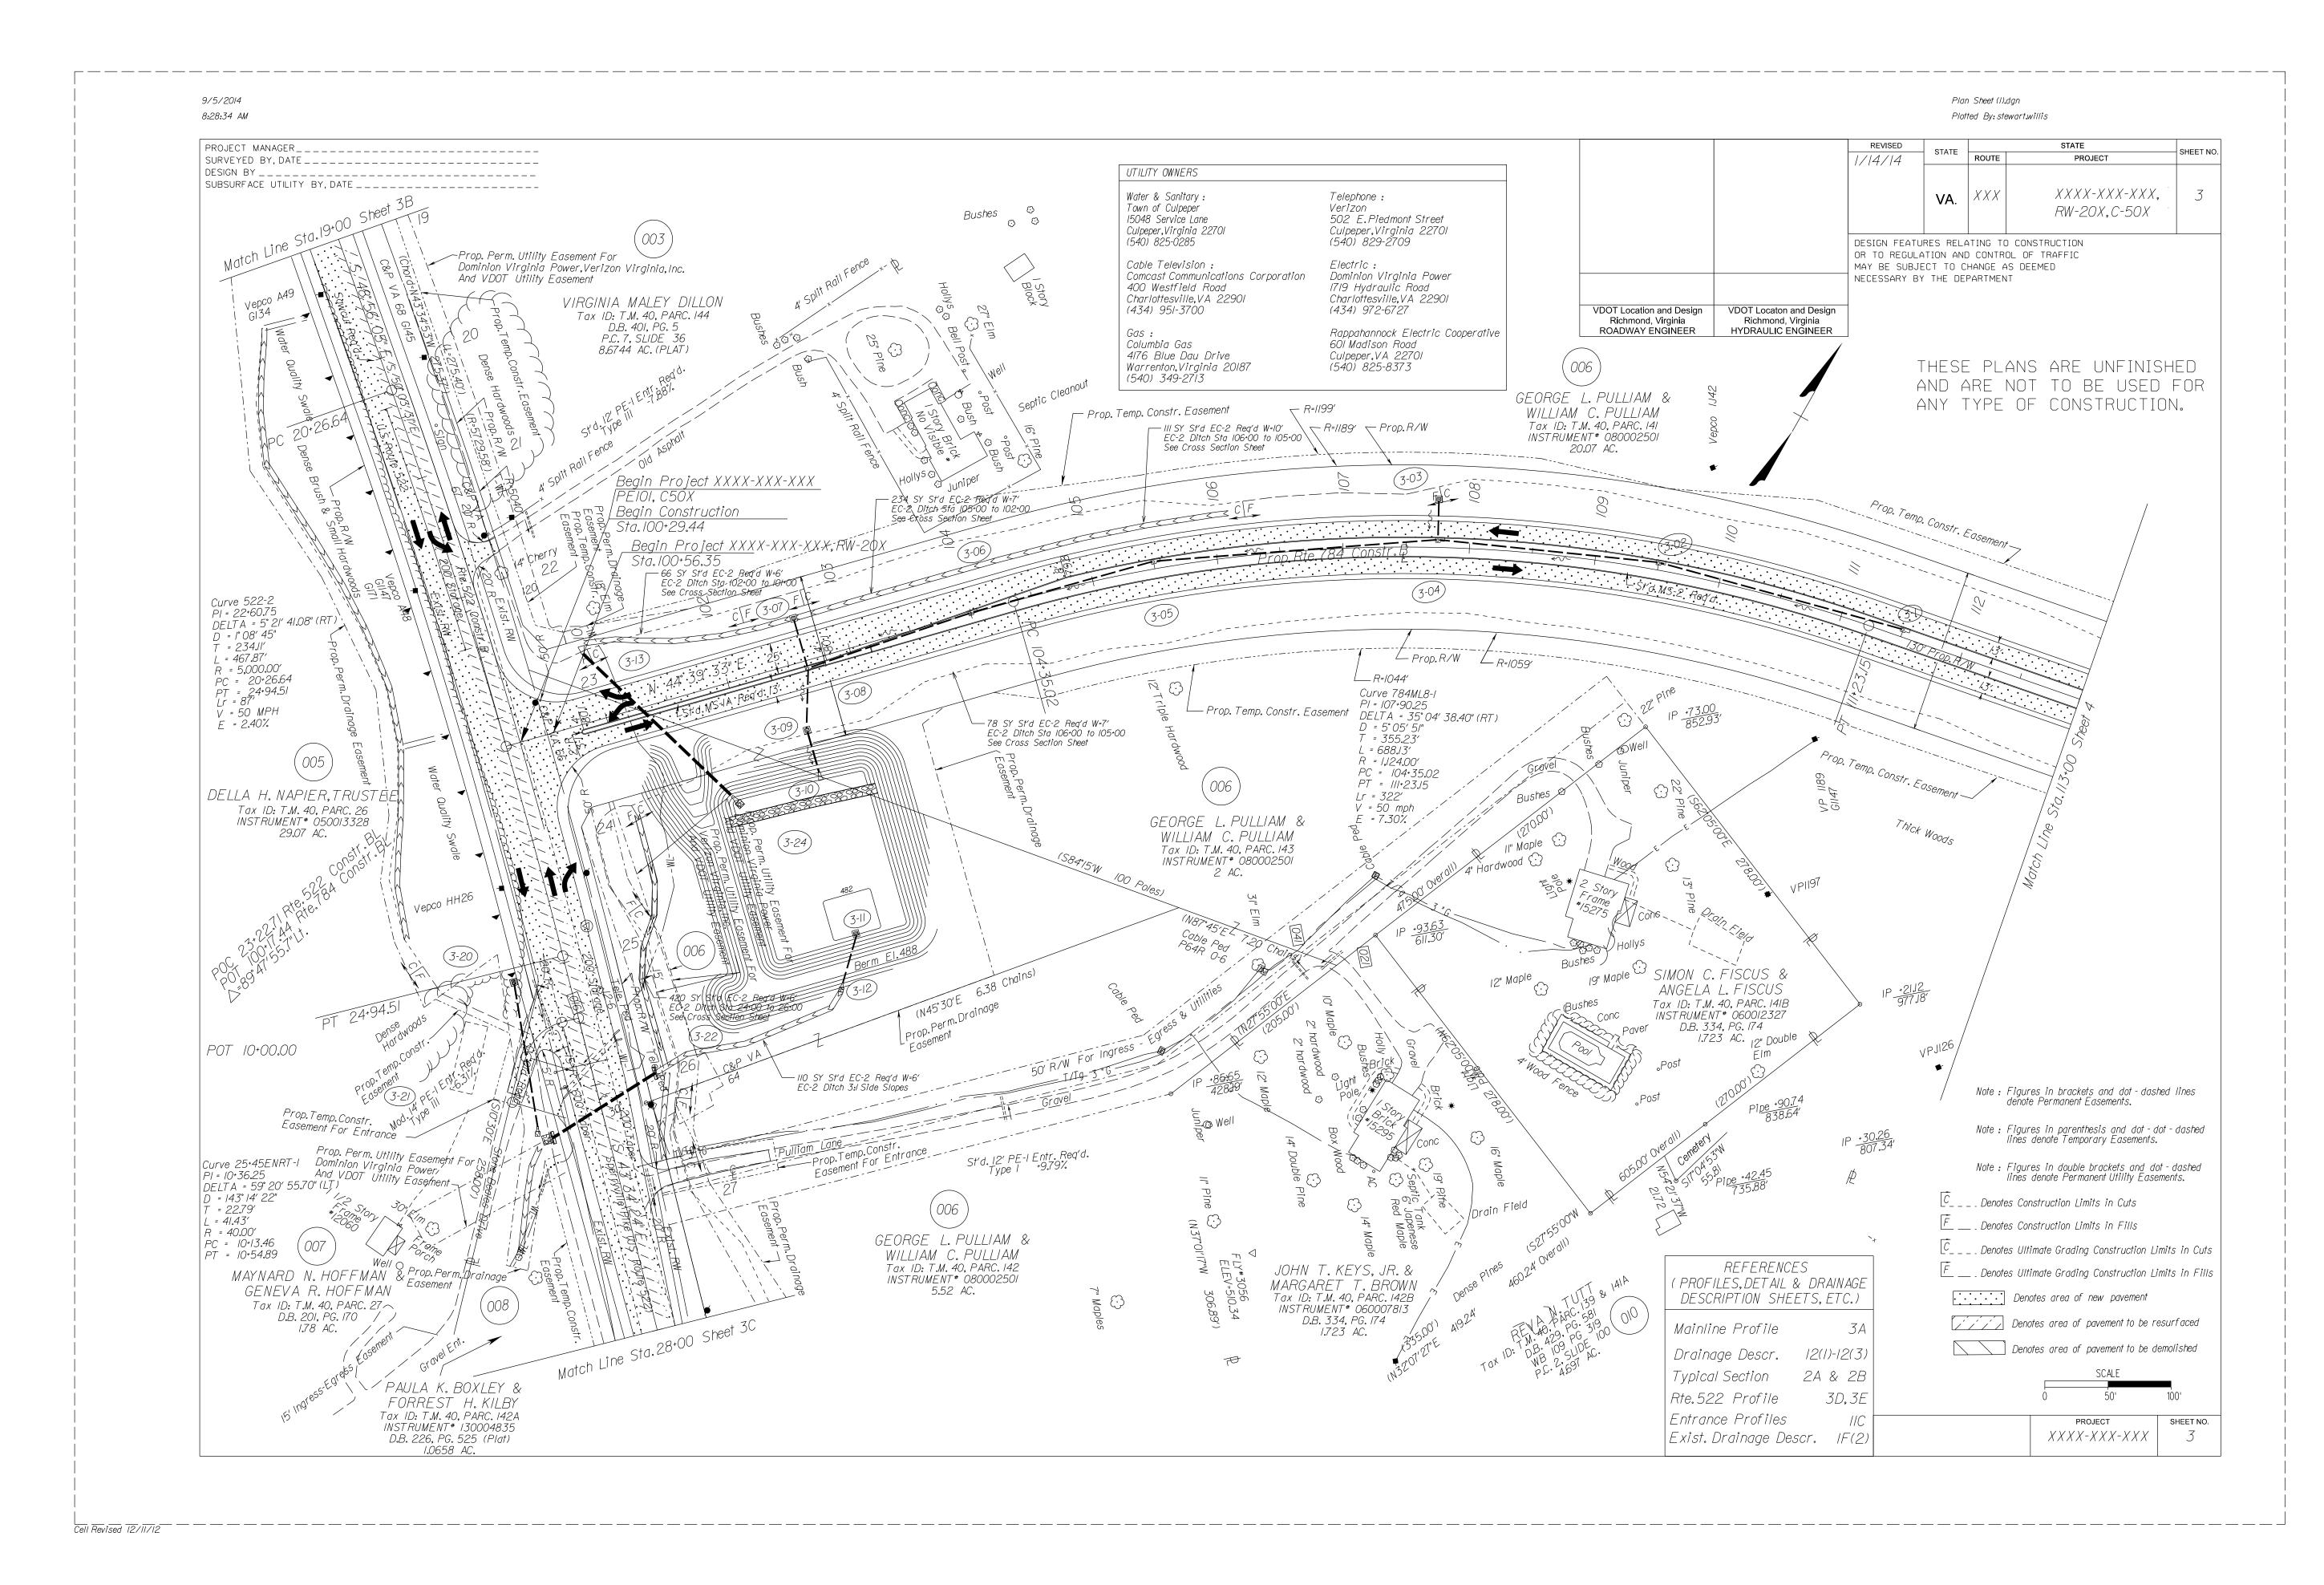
H - 31 SAMPLE 1 PLAN SHEET
